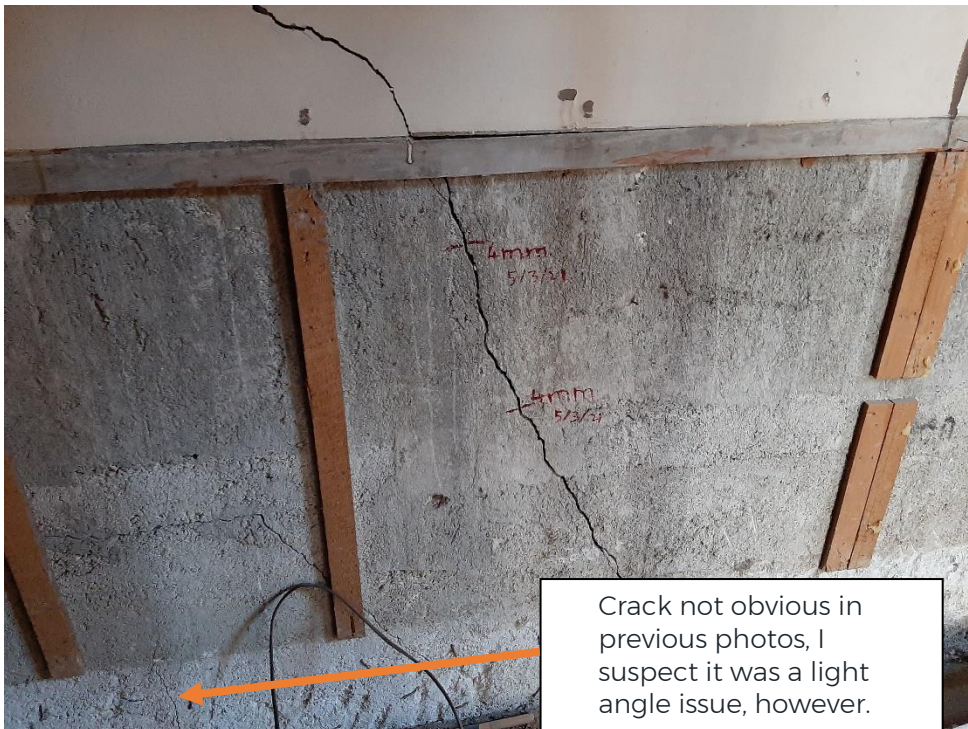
Crack in Central Atrium Behind North Stairs from 5/3/21 inspection with width marks
